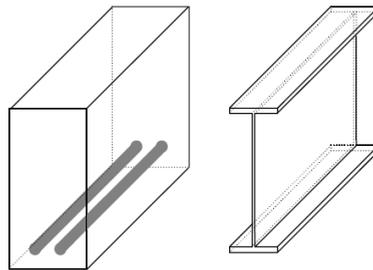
The energy required to produce reinforced concrete beam (109 MJ) was about half of that of steel I-beam (237 MJ) [2] ([Struble & Godfrey, 2006](#))
